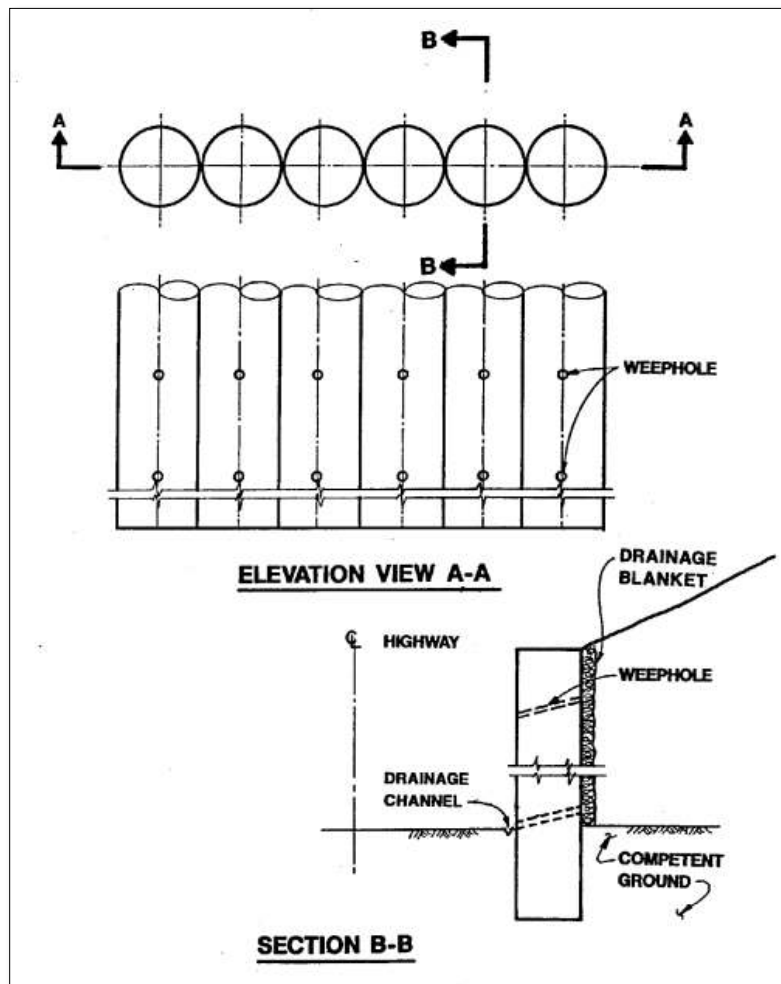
Tangent Pile Wall Plan, Section, And Elevation [50]
